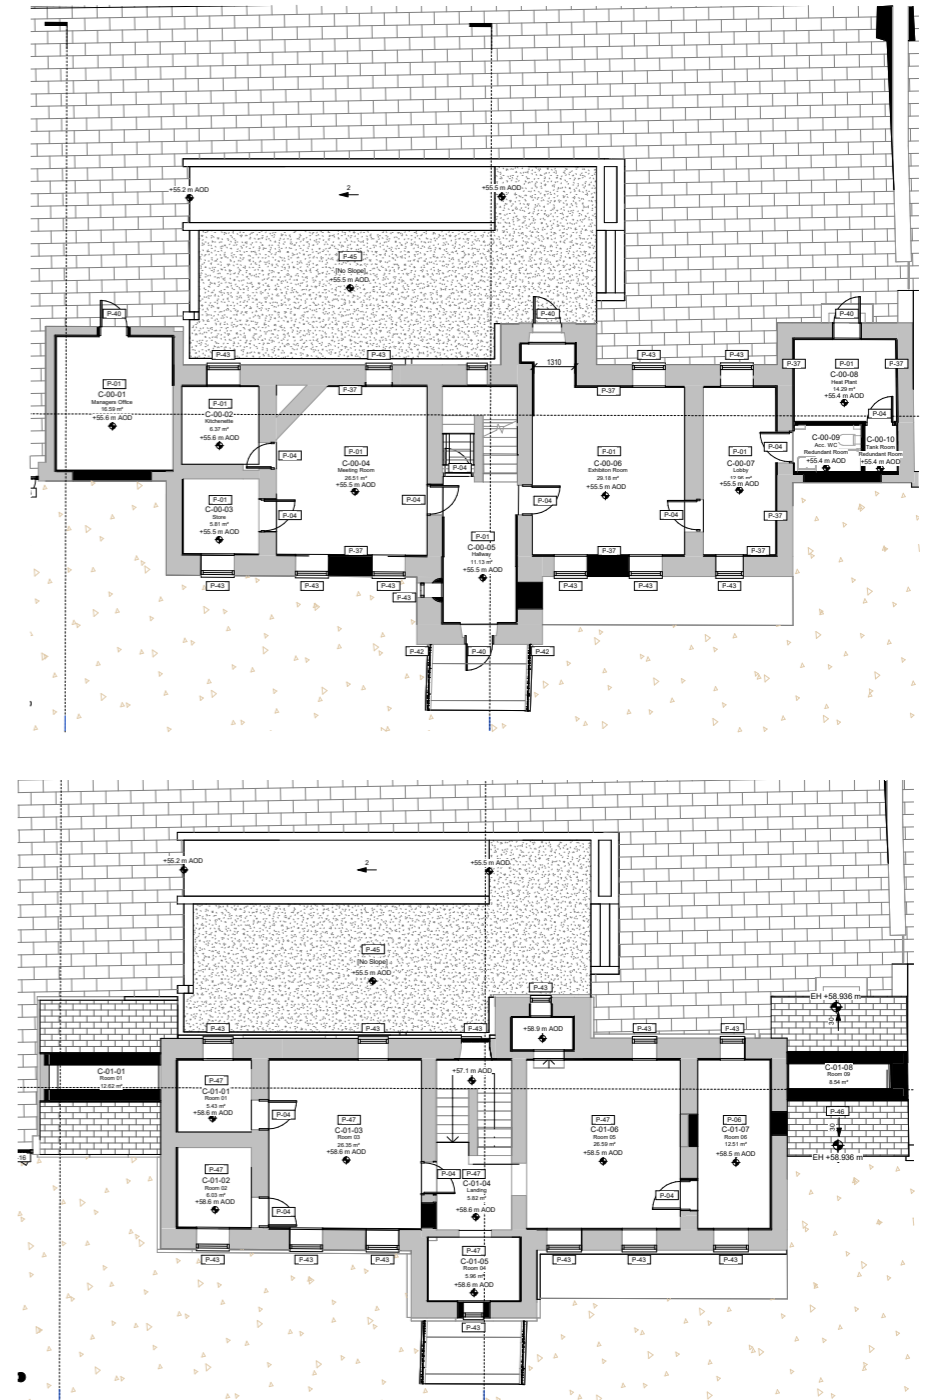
; Proposed Ground and First Floor Plan. Interventions in Black
